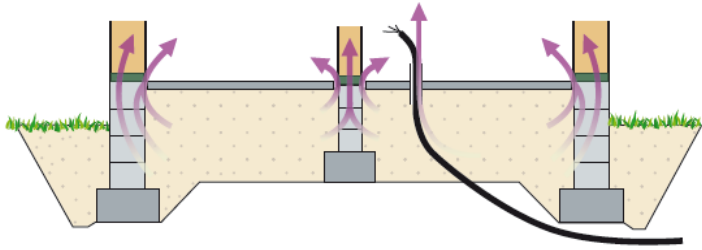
Entry routes of soil air in a Finnish slab-on-ground foundation. The foundation wall is constructed of permeable light-weight concrete blocks.
